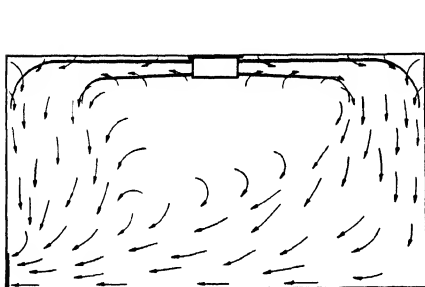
PLAN VIEW SHORT THROW SUPPLY OUTLETS
